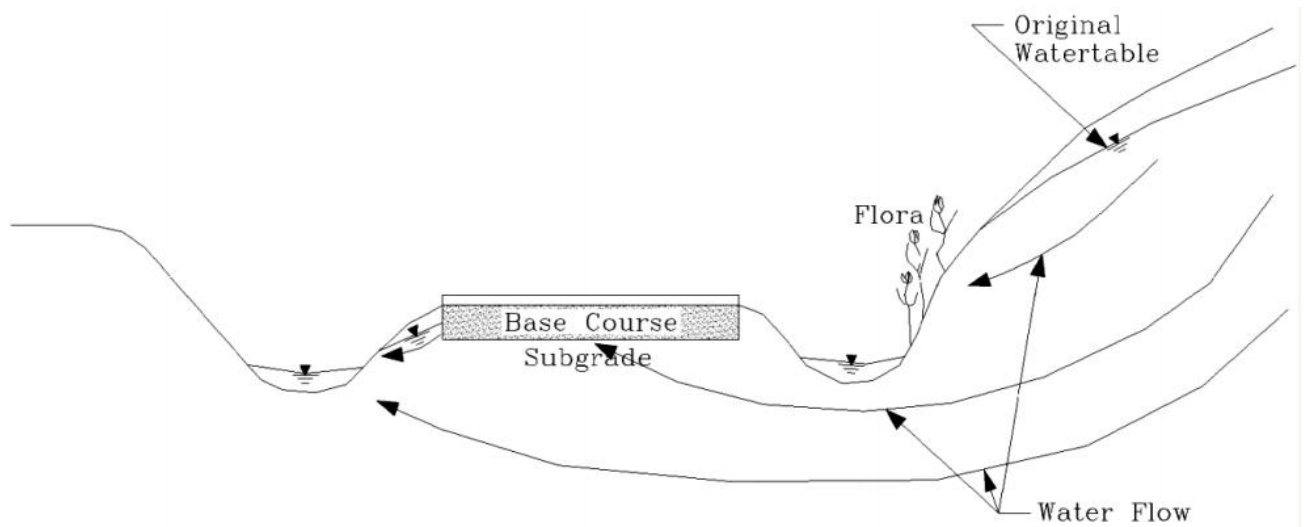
Lateral (gravity) flow of groundwater towards the roadway.
